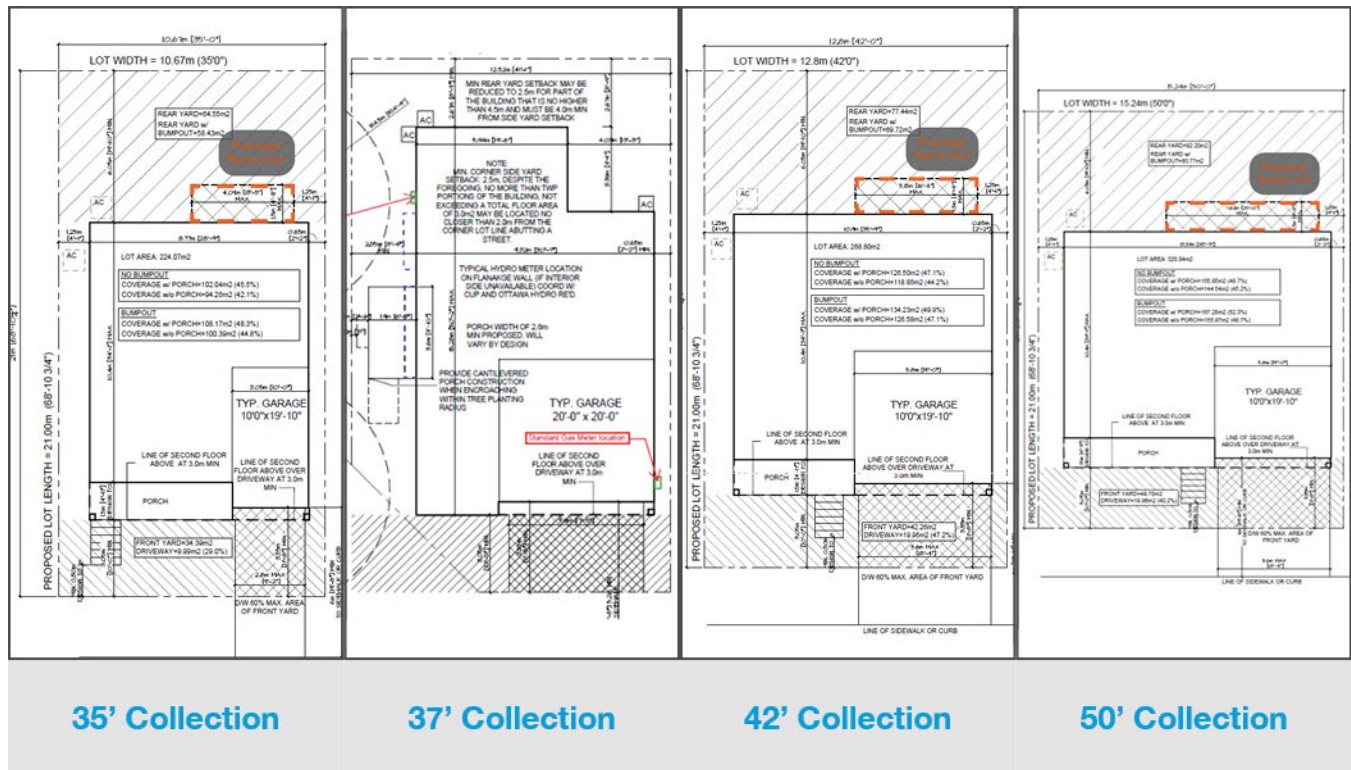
Proposed site plan models, indicating the proposed rear-yard "bump-outs".
